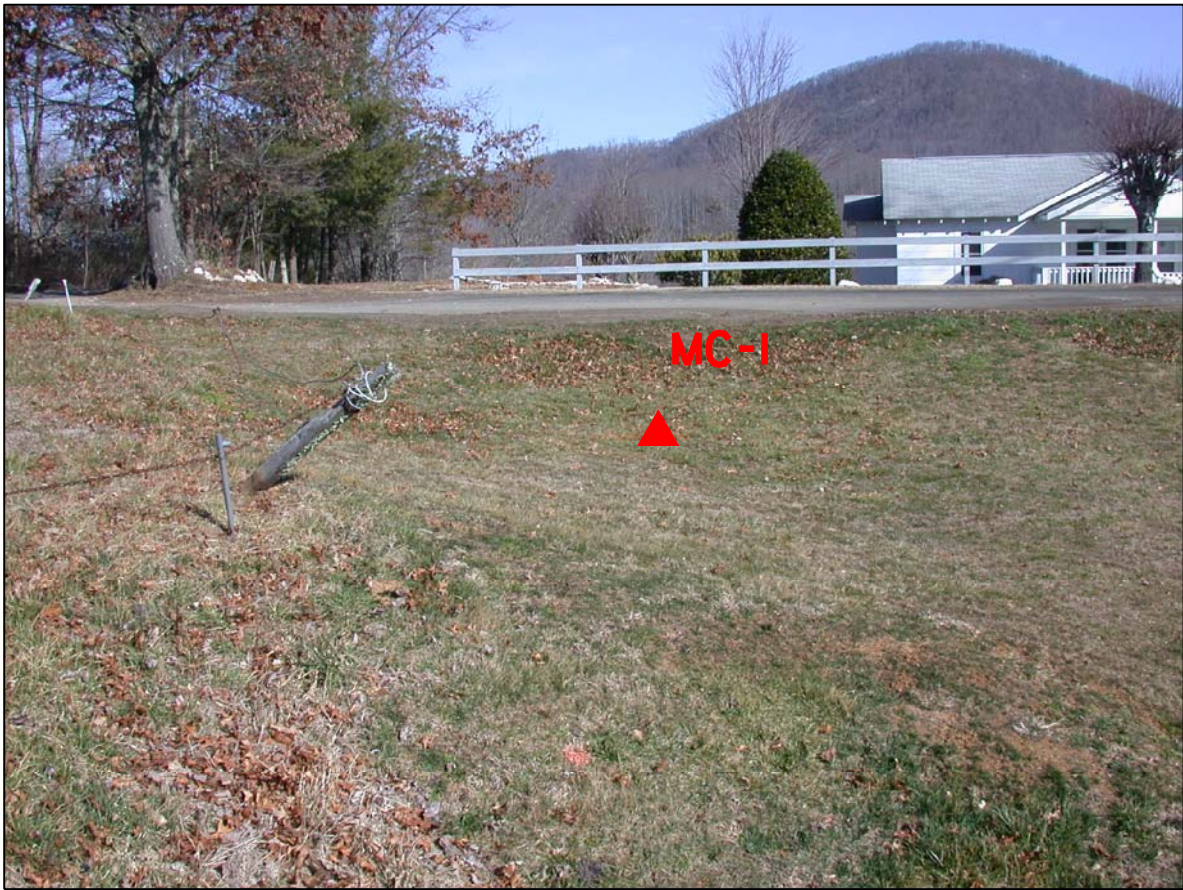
BORING IN RIGHT-OF-WAY LOOKING NORTH
